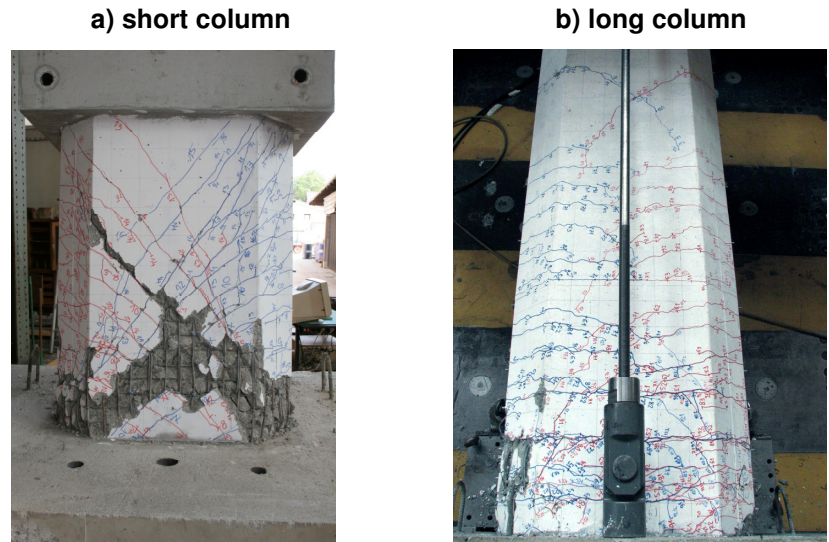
Damage of the columns in the end of the experiment (Bevc et. al 2006).
